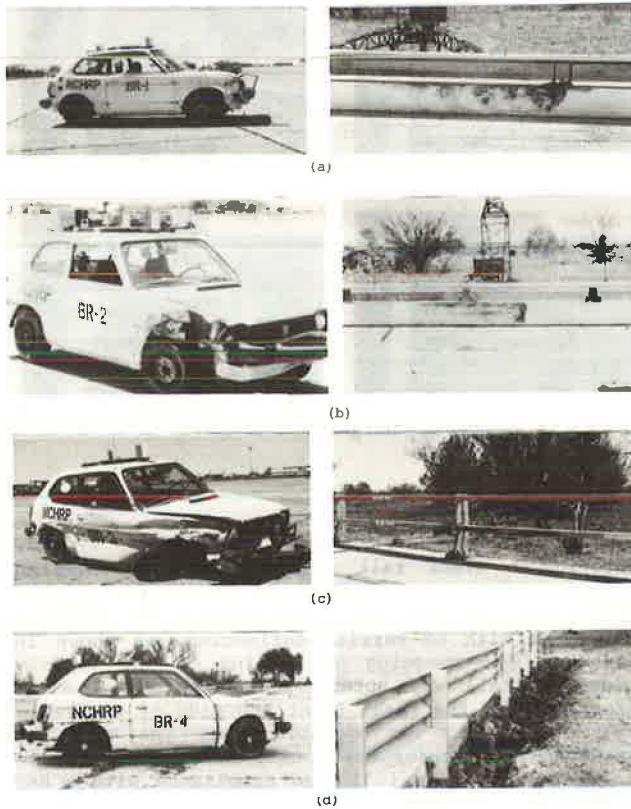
Barrier and vehicle damage after bridge-rail tests: (a) Test BR-1, System BR2; (b) Test BR-2, Texas Type T4; (c) Test BR-3, System BR3; (d) Test BR-4, Service Level 1 bridge rail.
